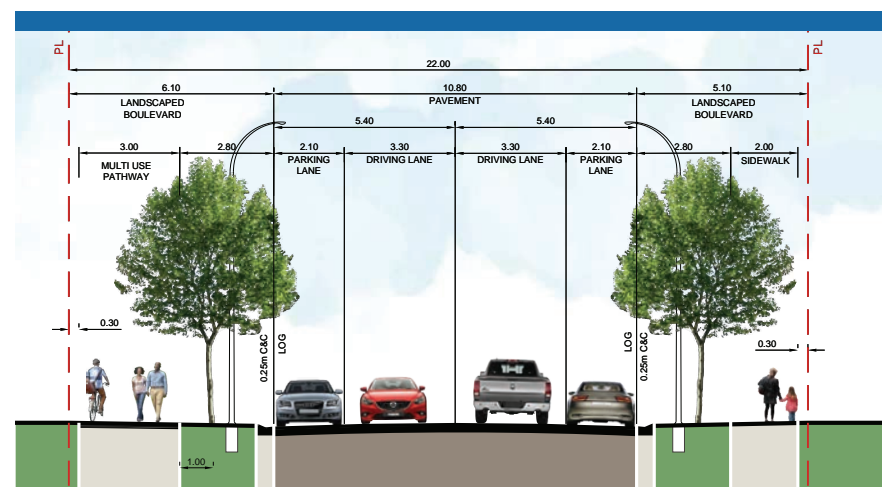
ROAD SECTION | MODIFIED ONE-WAY COLLECTOR ROAD – 11.0M
